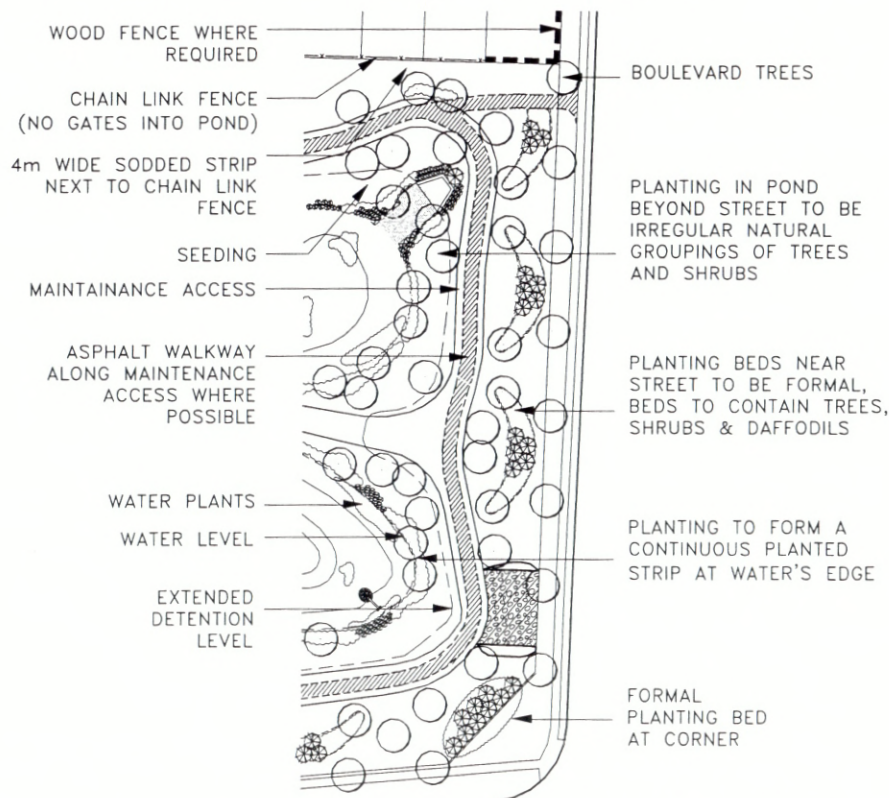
TYPICAL STORMWATER MANAGEMENT POND N.T.S.
